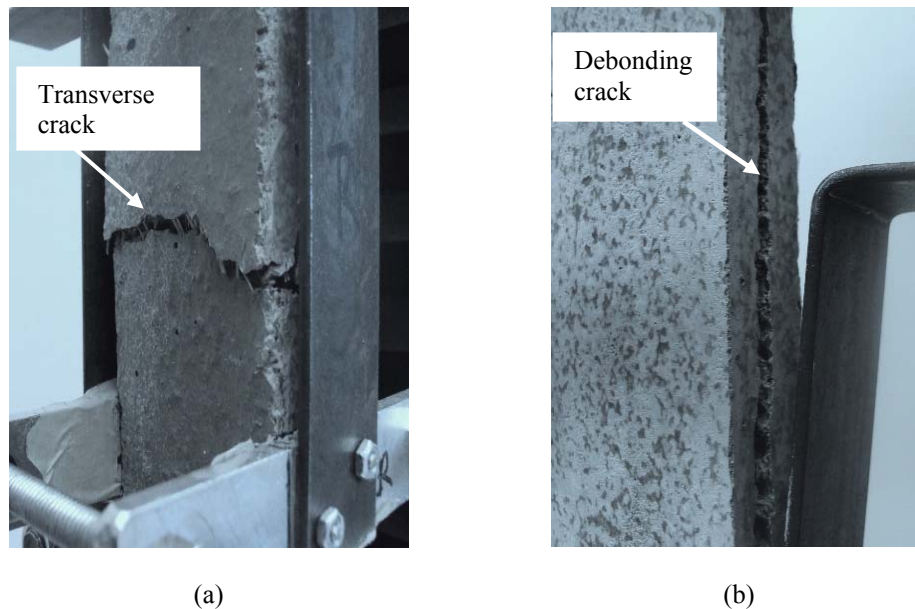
Typical observed crack pattern at failure of textile reinforced concrete: (a) transverse crack; (b) Longitudinal or splitting cracks
